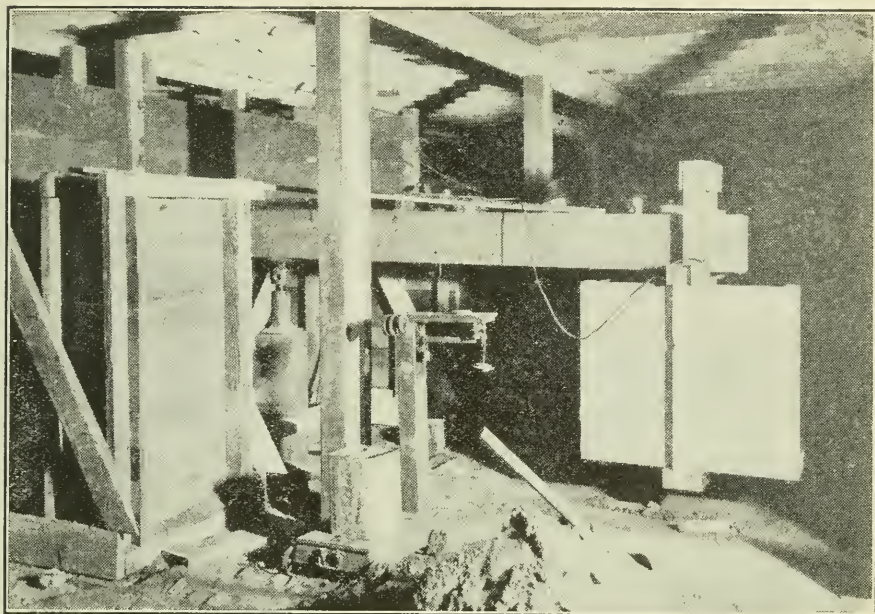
SOIL TESTING APPARATUS IN POSITION.
